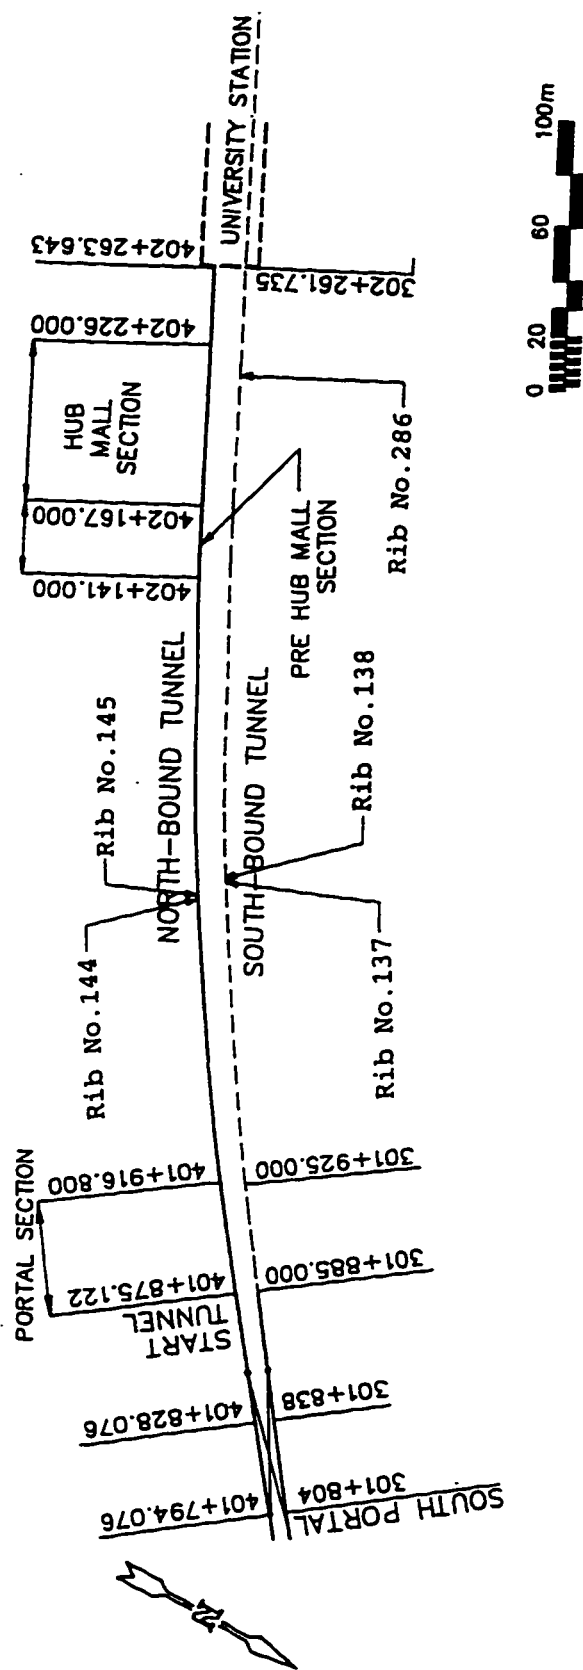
Plan View of Tunnel Sections with the Location of the Instrumented Ribs
